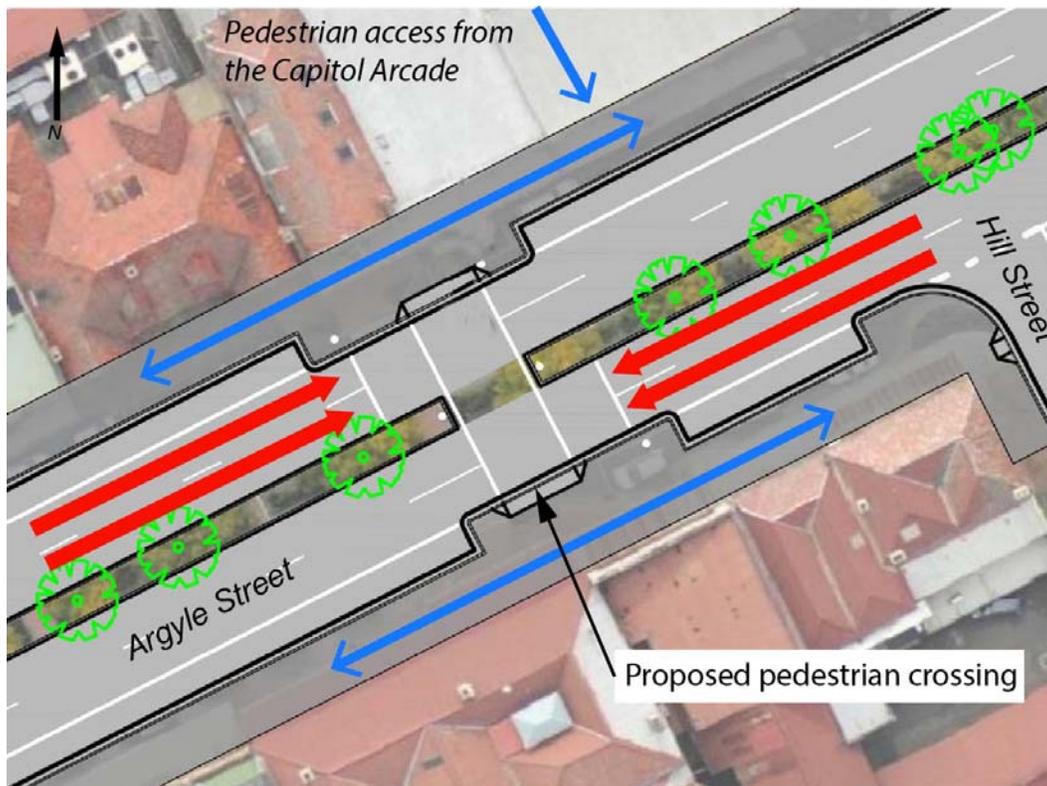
Mid Block pedestrian crossing between John Street and Hill Street
